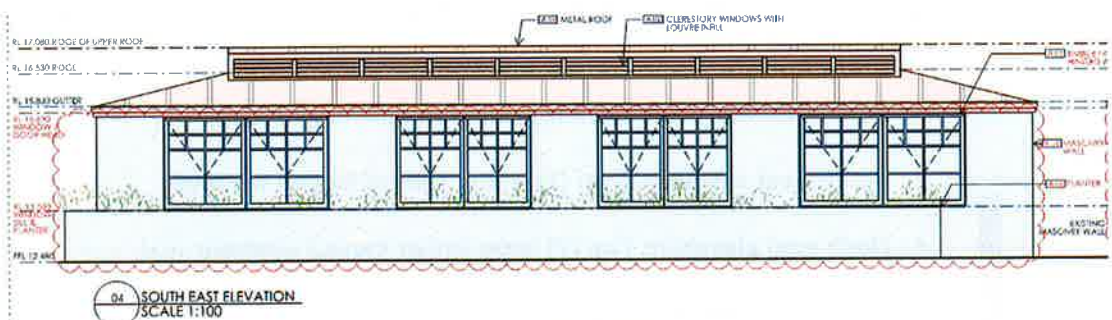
Proposed South East Elevation (Source: Akin Creative).
